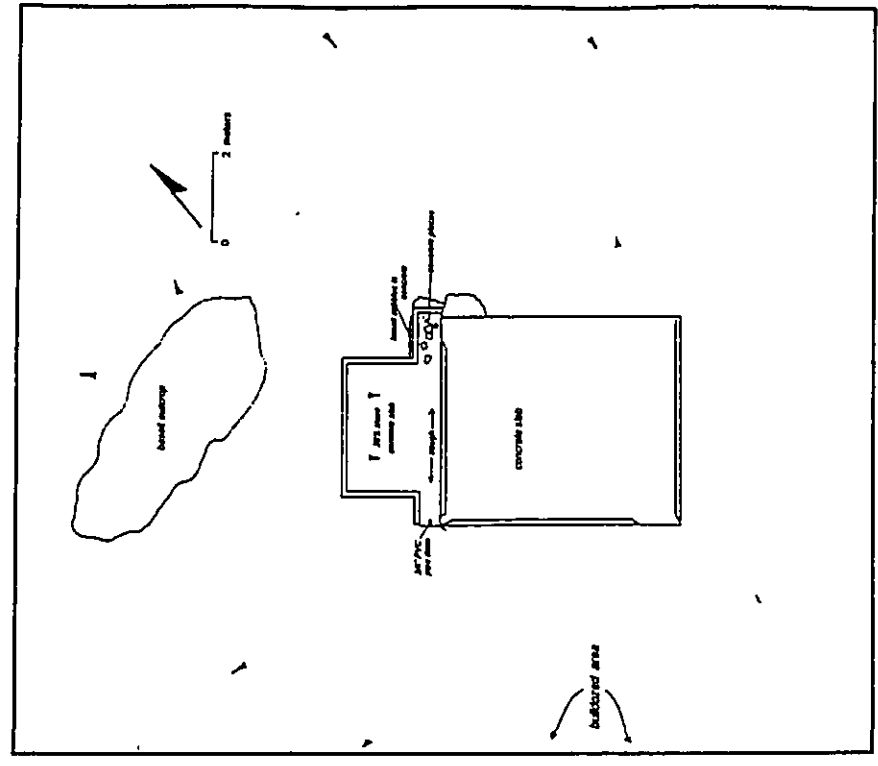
Plan view of Site 5096—old slaughterhouse foundation.
